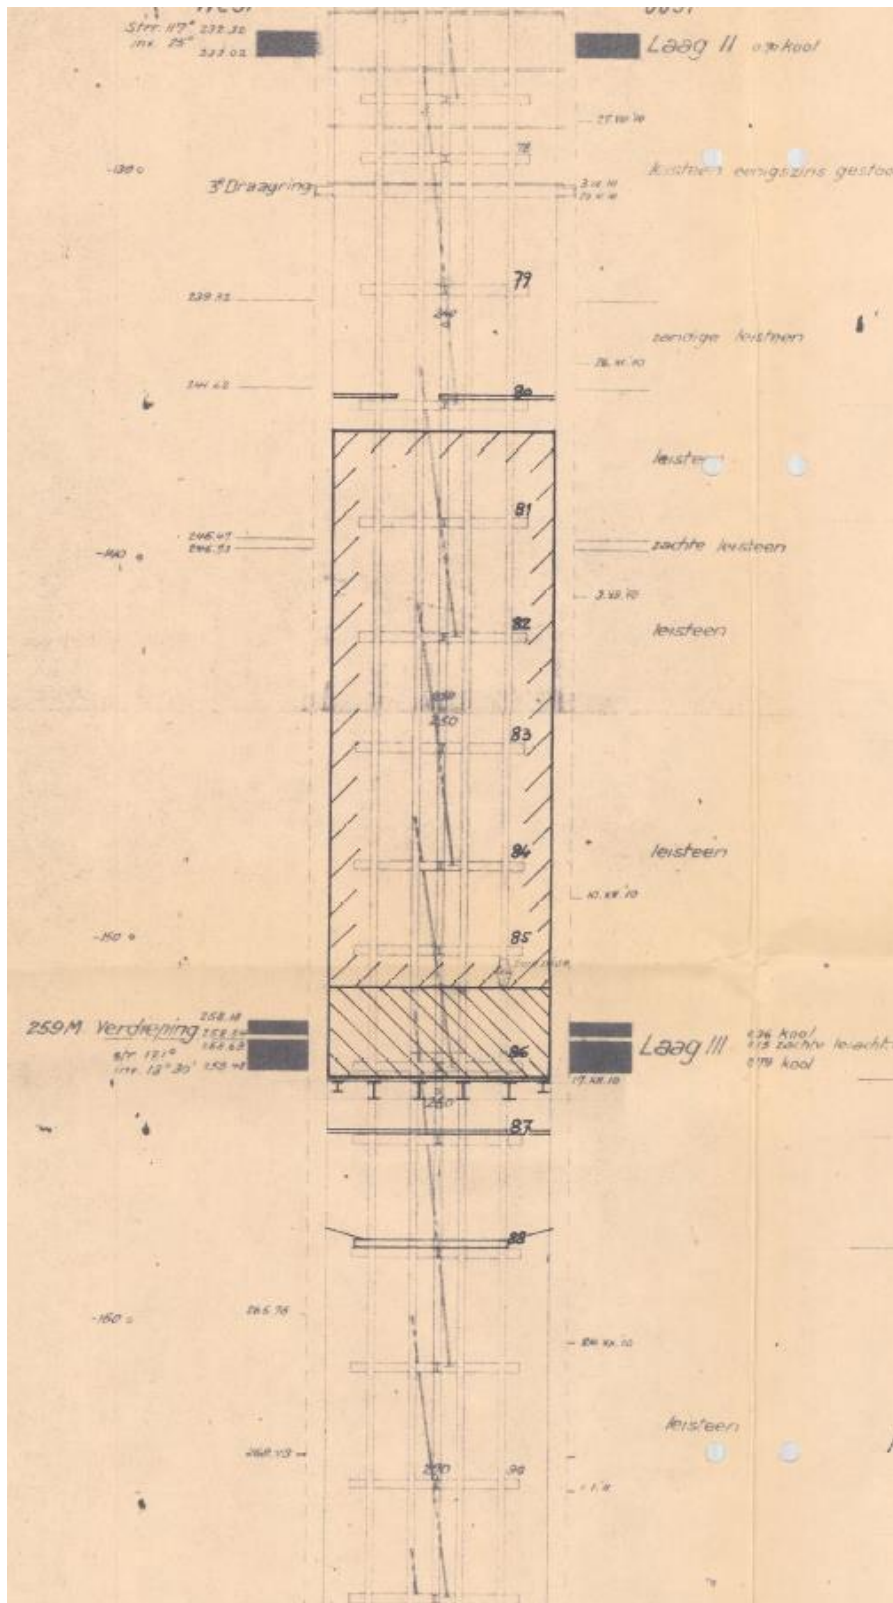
Strata shaft I Emma, 259 m floor /52/
